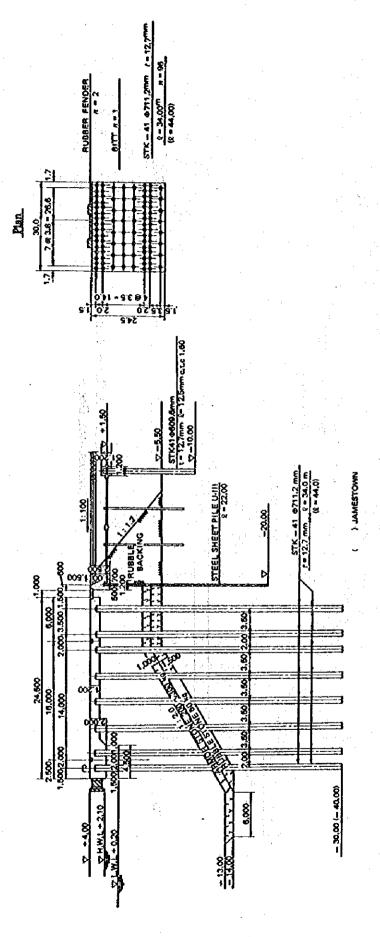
Typical Section of Container Wharf (Jamestown, Opobo)
